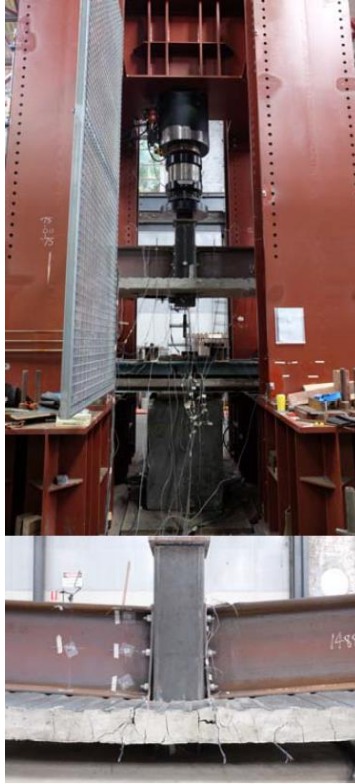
Composite steel-concrete beam and slab systems, Australia
